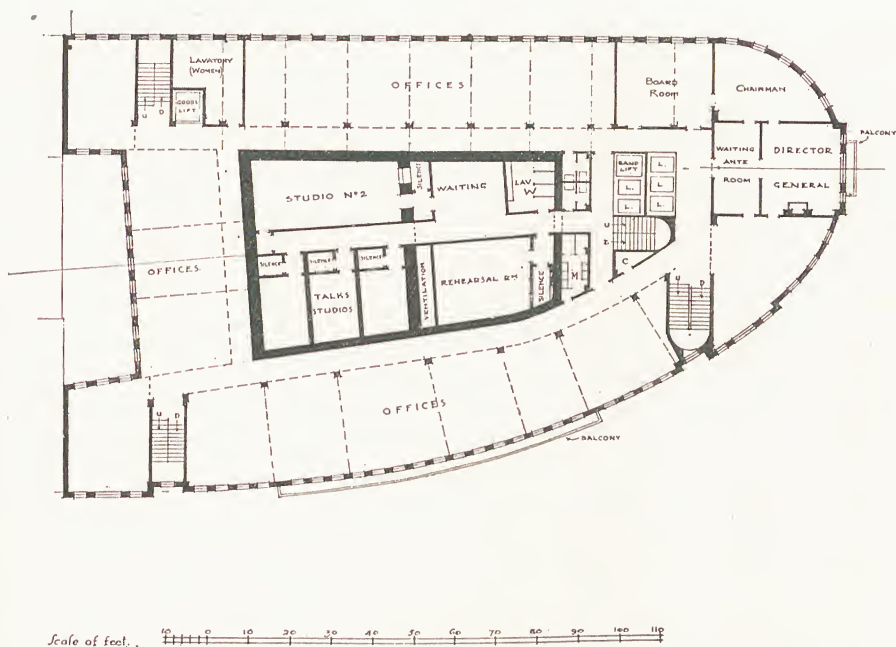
BROADCASTING HOUSE—PLAN OF THE THIRD FLOOR
